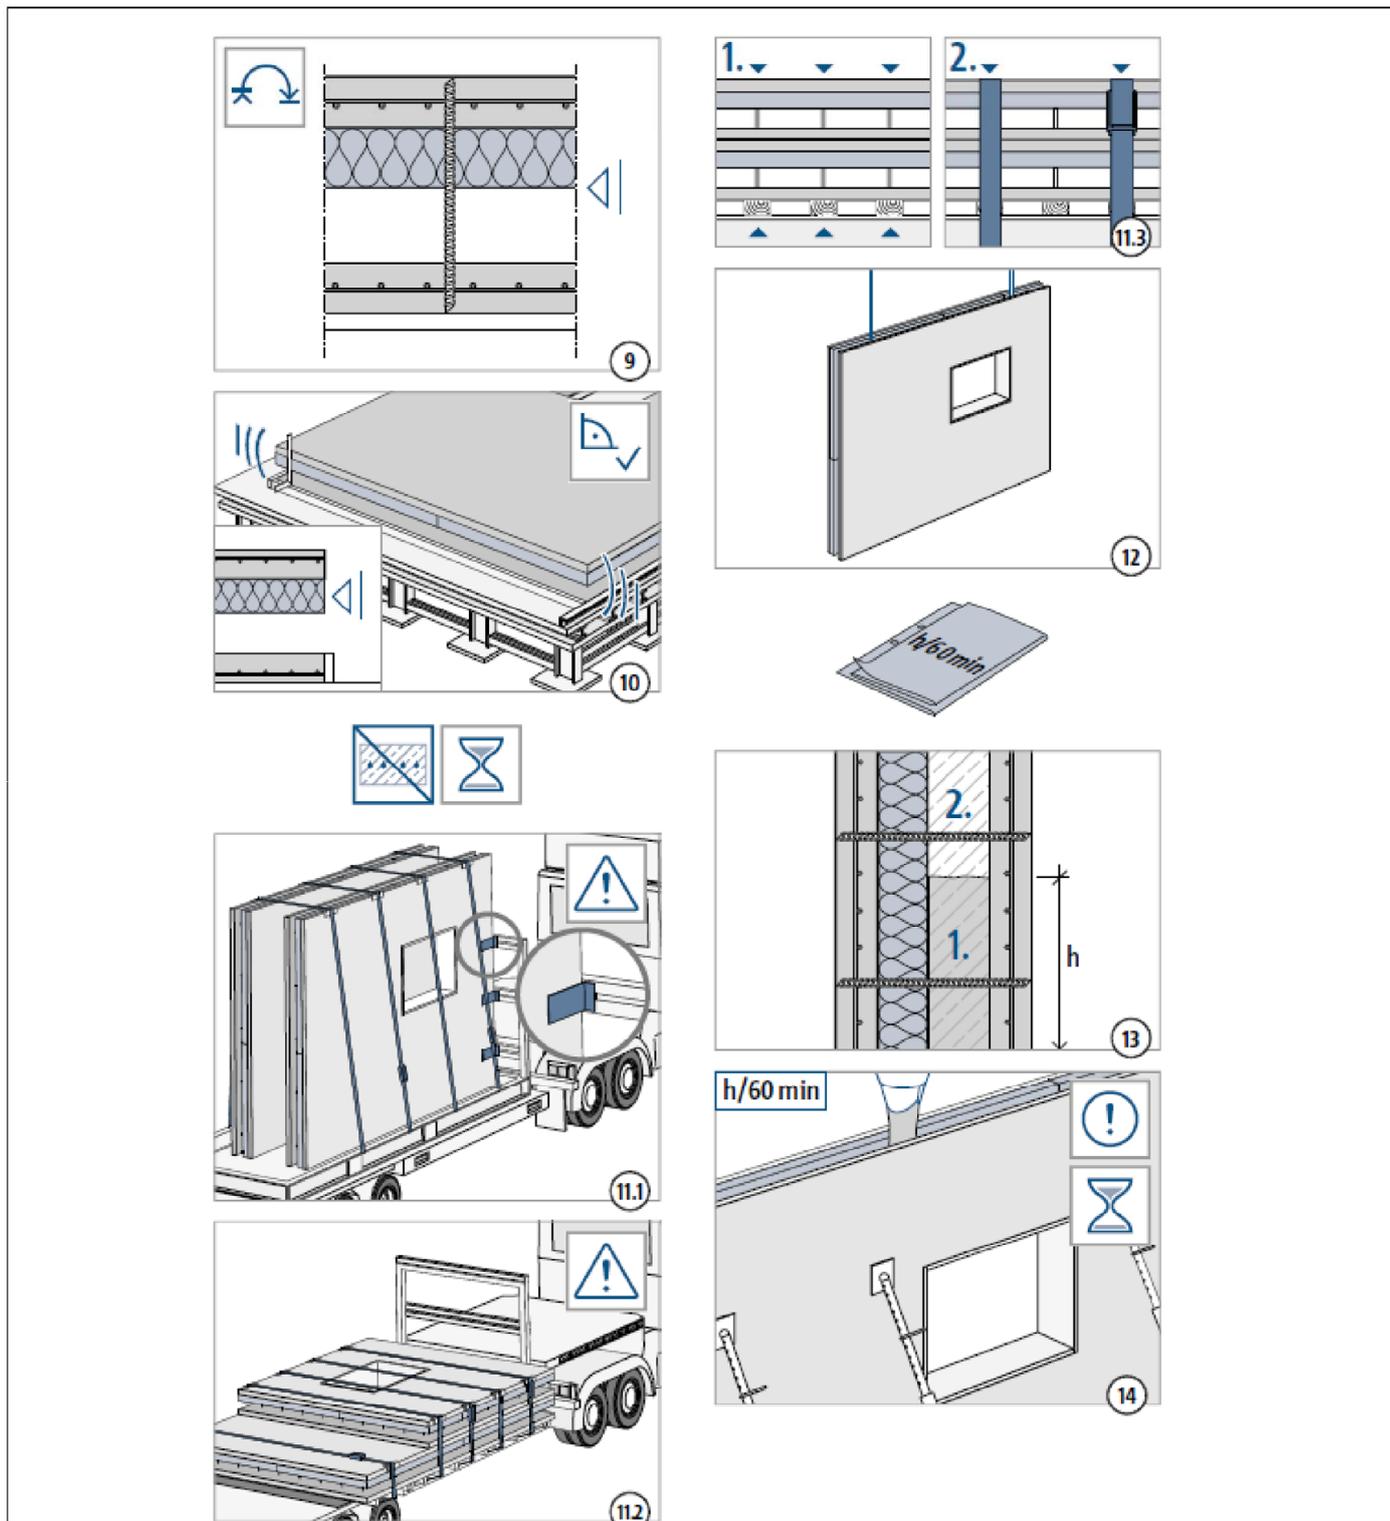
Installation instruction - Schöck Isolink® for element wall – page 2
